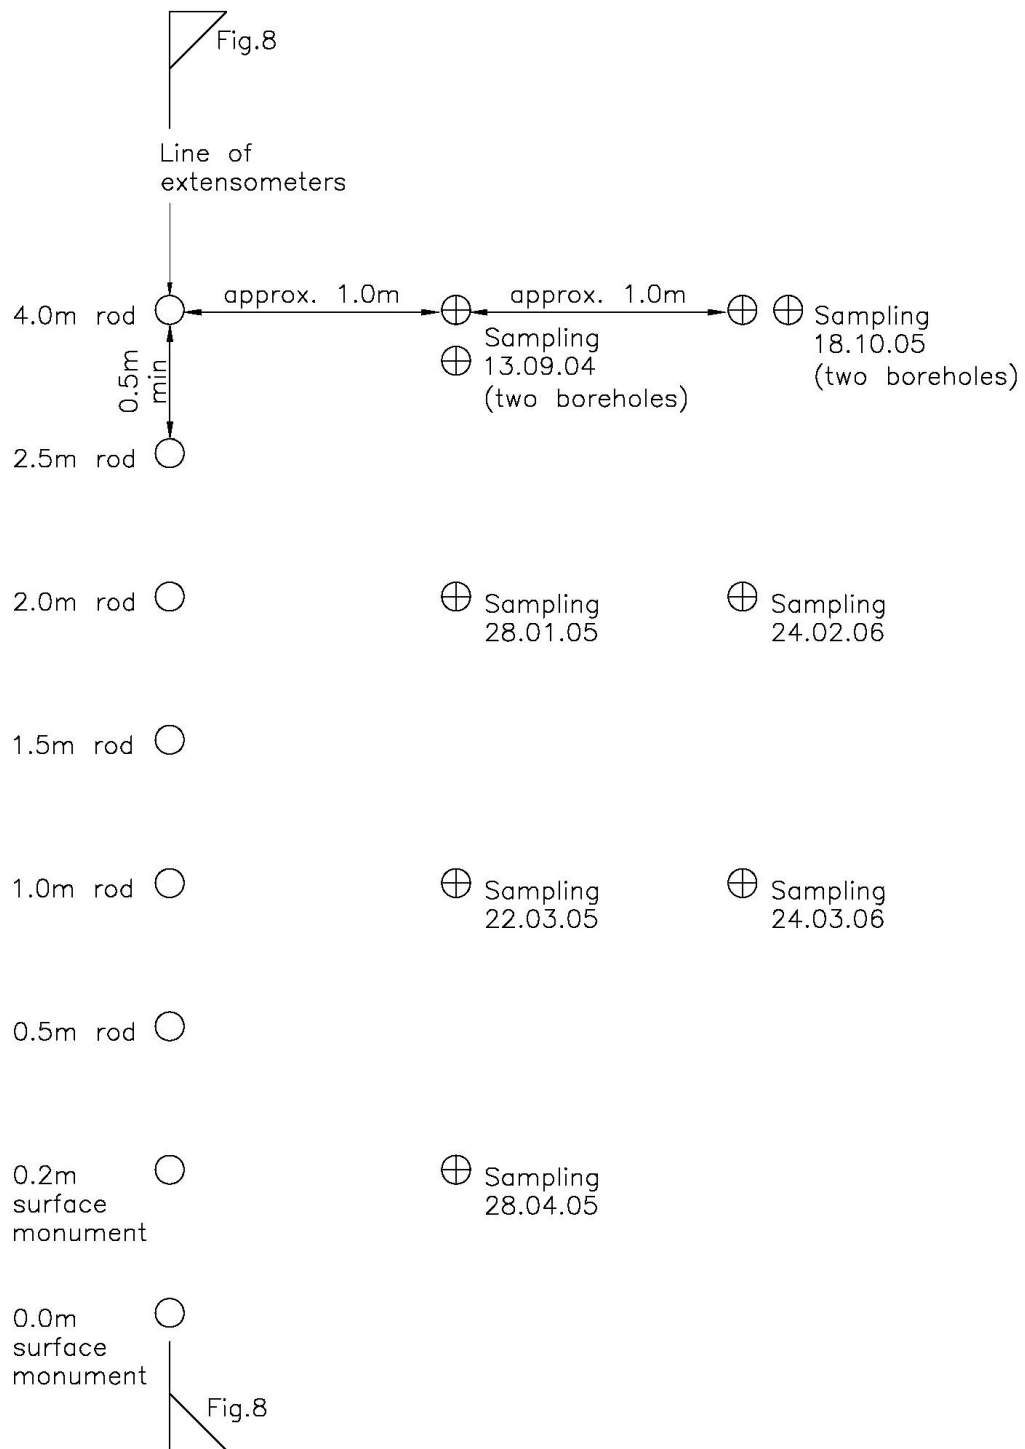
Sketch plan showing typical extensometer and borehole sampling layout
